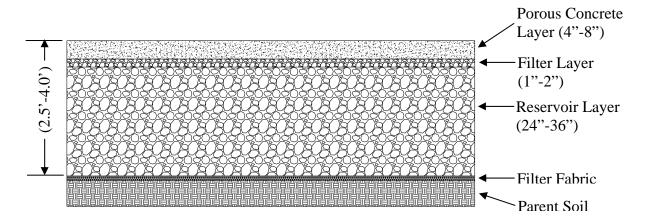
Typical Porous Pavement Cross Section (EPA, 1999)
